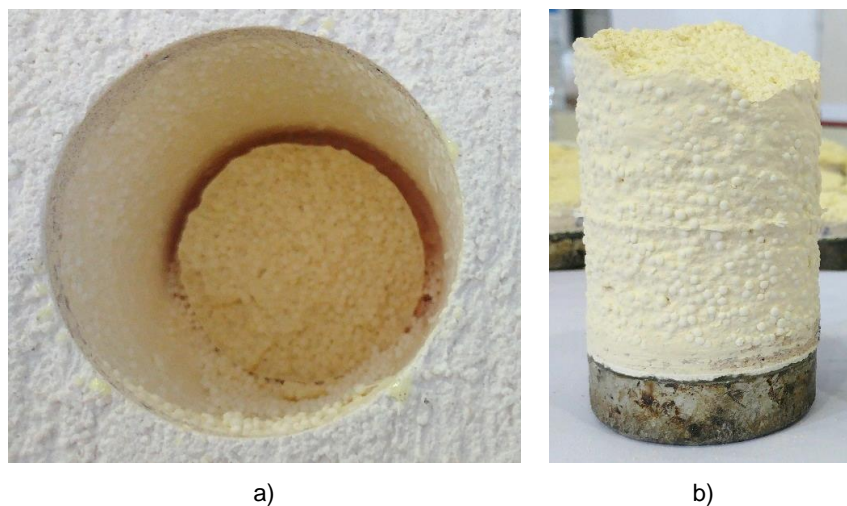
Pre-cut into the substrate: a) Cutting zone; b) Resulting specimen.
